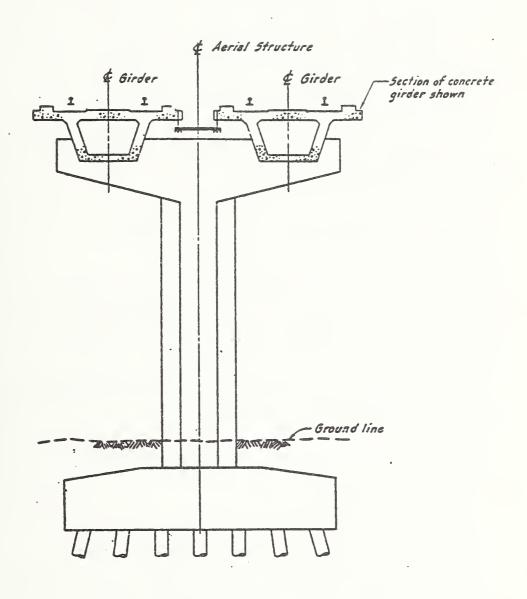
BART AERIAL STRUCTURE STANDARD TYPICAL SECTION
